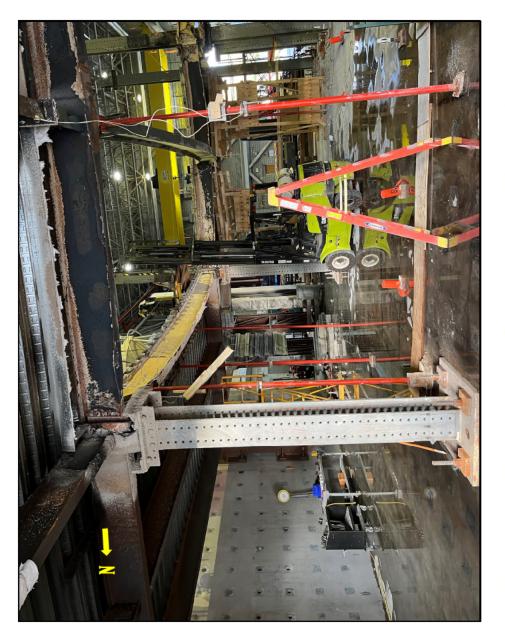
Image showing the fork truck with elevated load, water on the strong floor, and shoring poles (reddish orange) underneath the surrounding floor. Image taken looking east.
